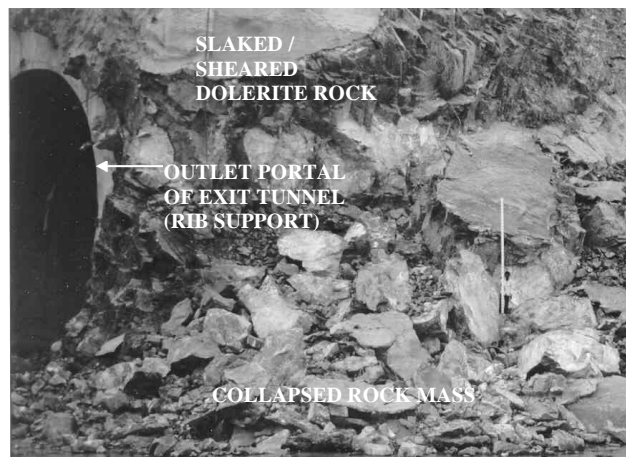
Exposure of slaked dolerite rock at the outlet portal of the exit tunnel
